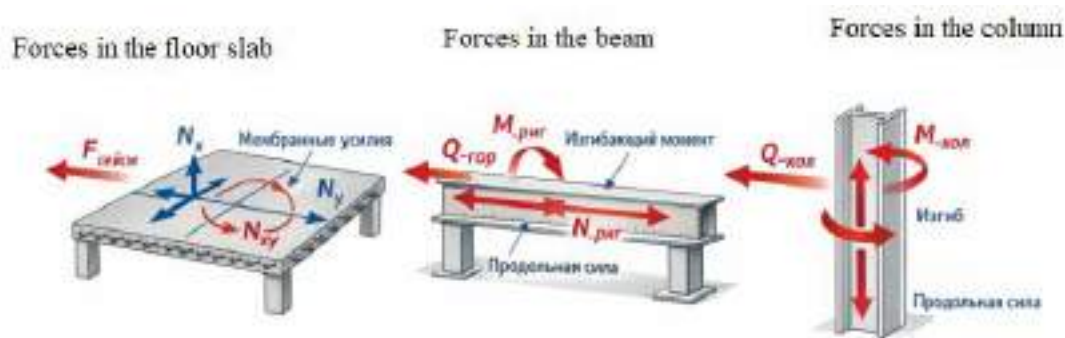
Internal forces in load-bearing elements of a frame building from seismic horizontal impacts.
